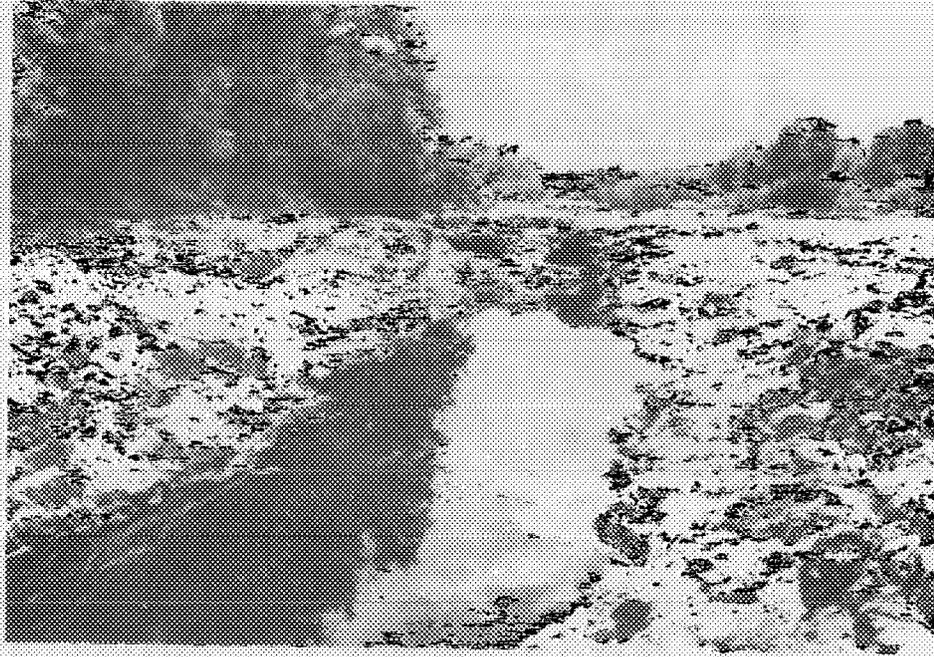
WEIR NO. 8 STA. 11+00 (CENTER OF PICTURE) PRIOR TO CONSTRUCTION
